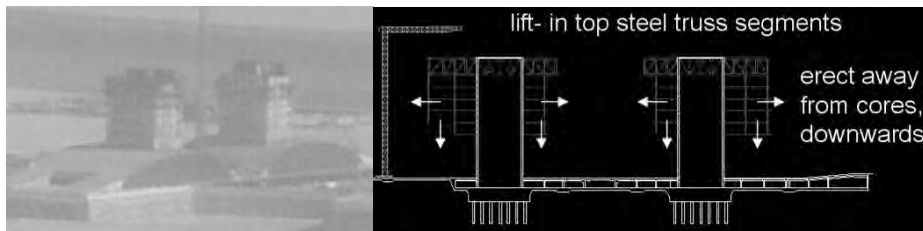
concrete 'wave' and cores (left); 'top- to- bottom' erection sequence (right)
